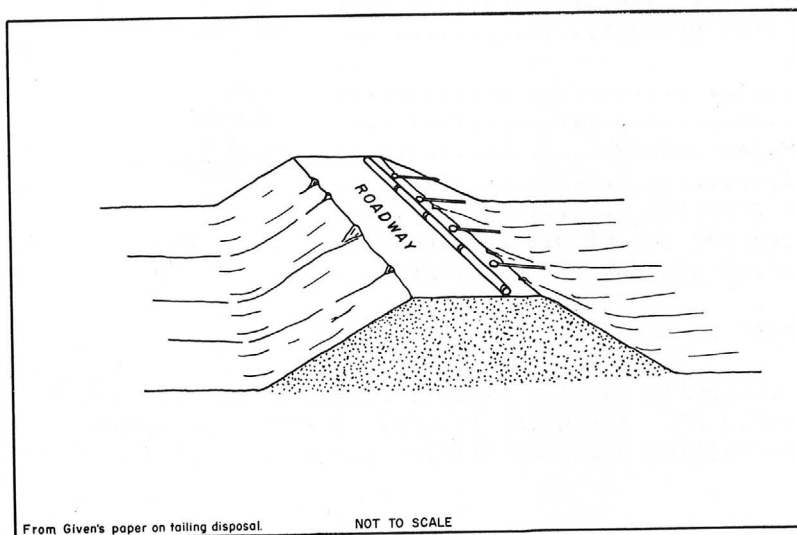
Original Earth Berm Showing Installation of Header and Discharge Pipes Into Storage Area.
